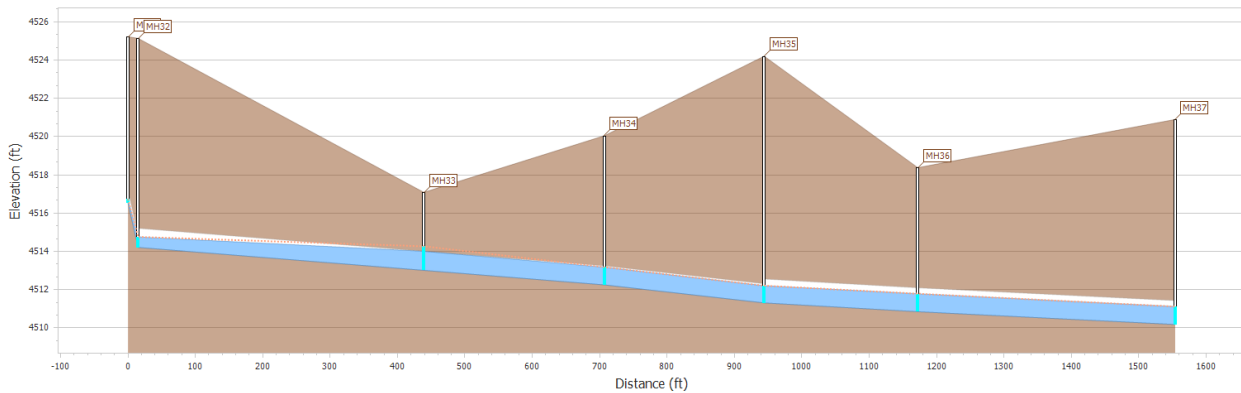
W 100 N Trunk – Master Plan HGL
